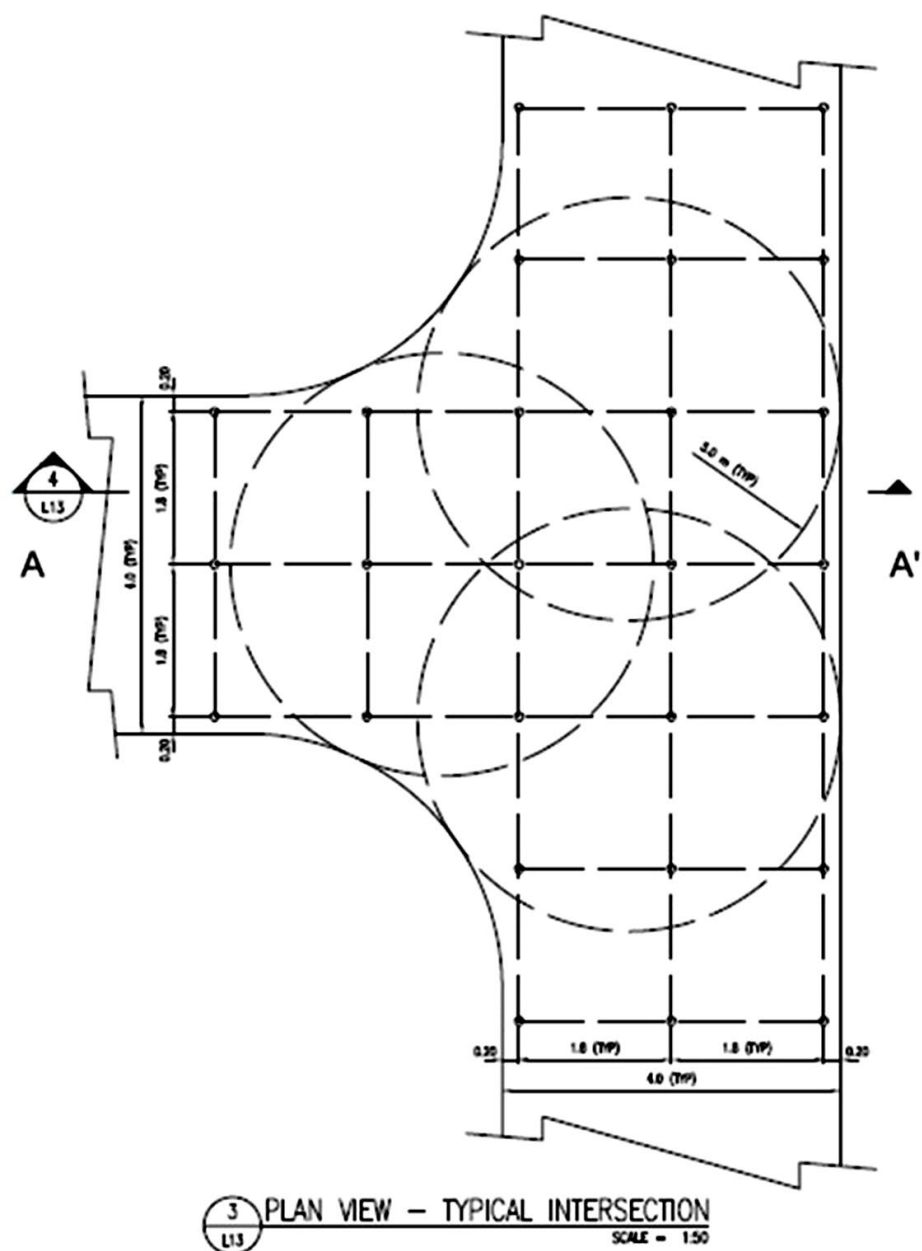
Plan of Cable Bolting Pattern in Intersections
